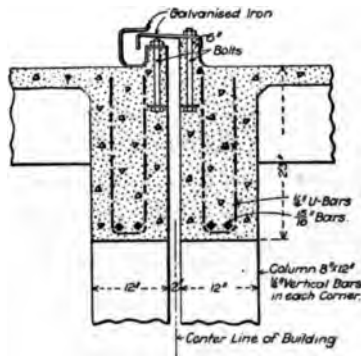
Expansion Joint in Roof, United Shoe Machinery Co.'s Factory.
